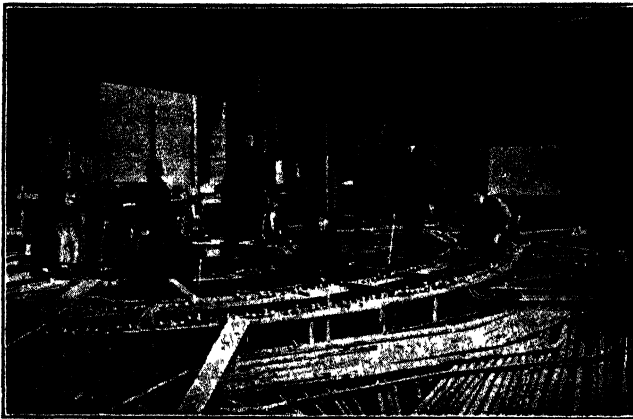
Conduits for switchboard for Generating Station A-2 of the Philadelphia Electric Co. (Courtesy, *Current News*.)
